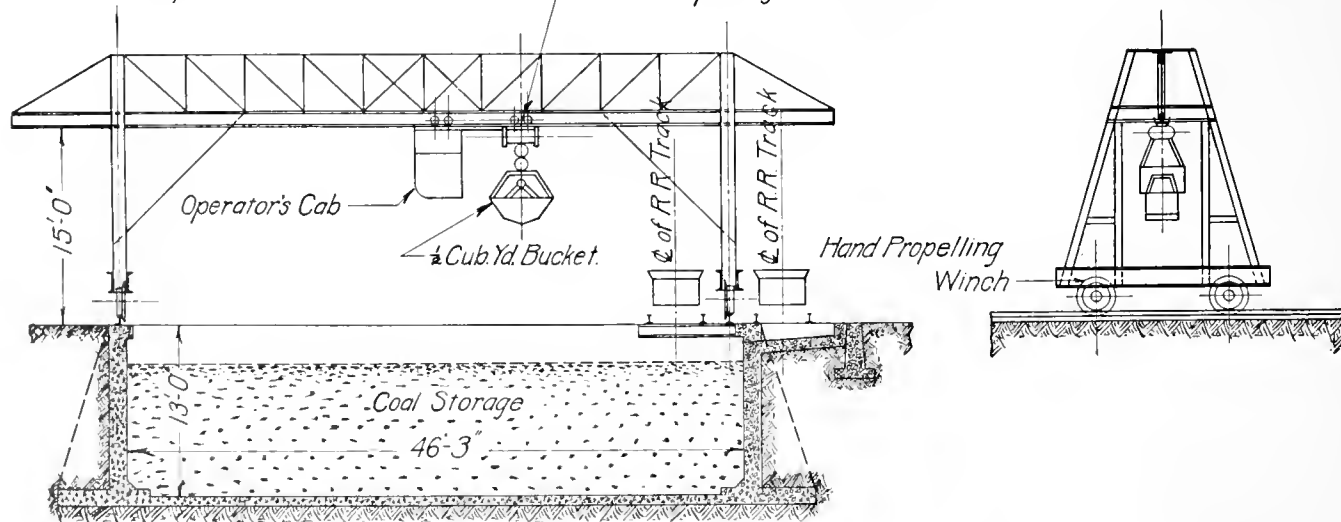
Storage Pit and Bridge of the Western Clock Works.
